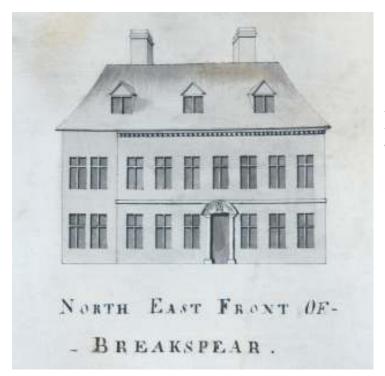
1771 Northern Elevation – the façade can be seen surrounding the door.
